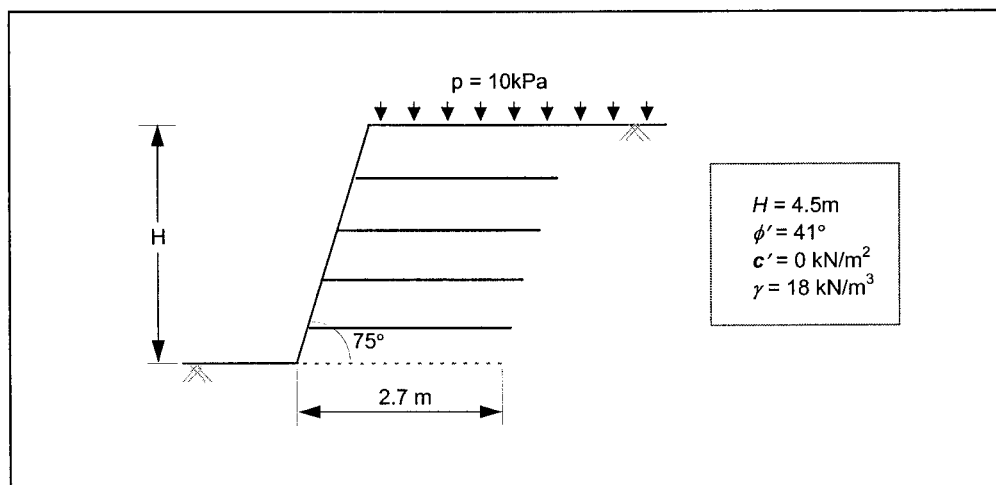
Design example for an embankment reinforced with geotextile sheets
